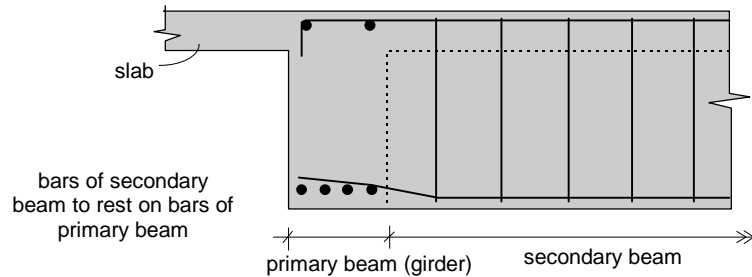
Bars of secondary beam to be placed over bars of primary beam, with suspender stirrups enclosing primary beam bars
